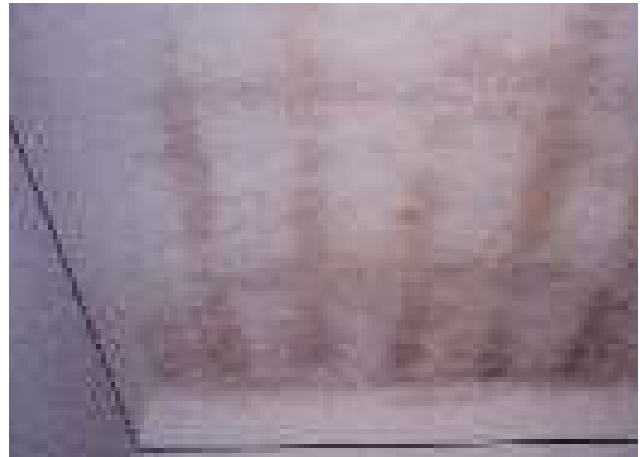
Type C2 concrete slab. Intrados surface decay and stains
